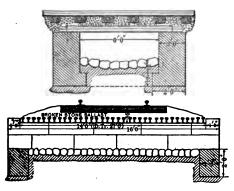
Standard Old-rail Culvert. N. & W. R.R. (1895.)
